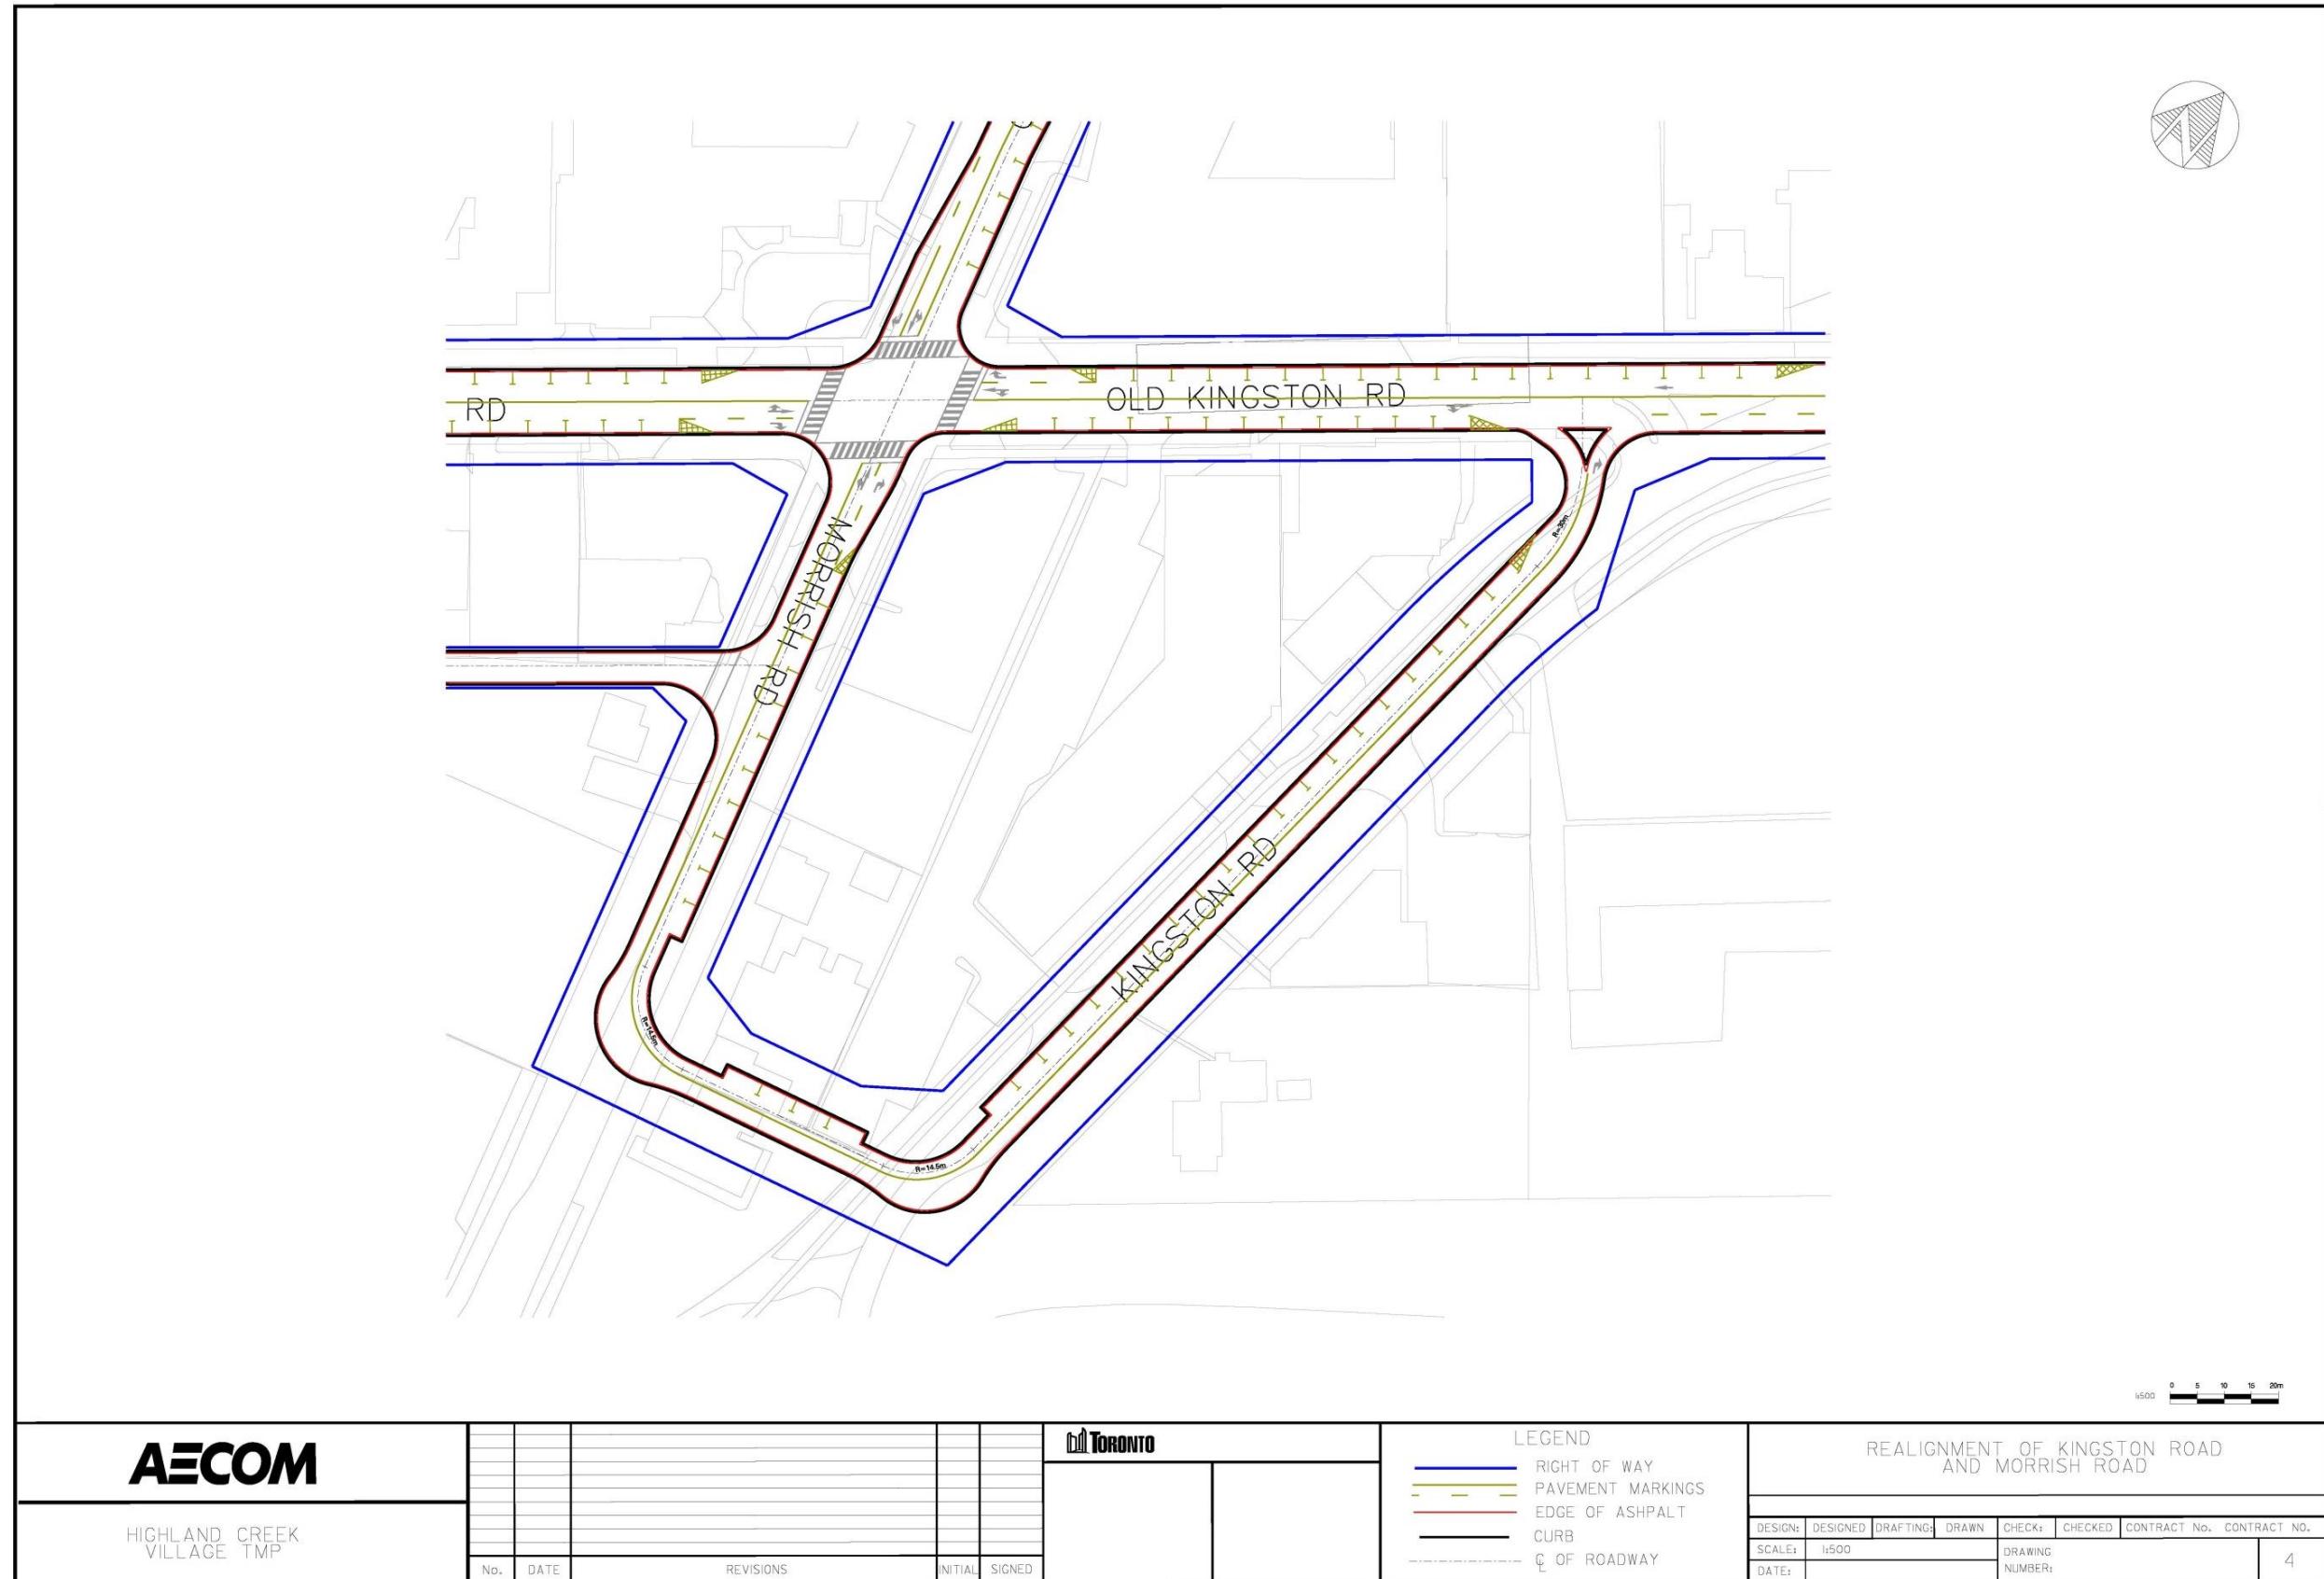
Urban Design Plan for Schedule A+ Project: Realignment of Kingston Road and Morrish Road
